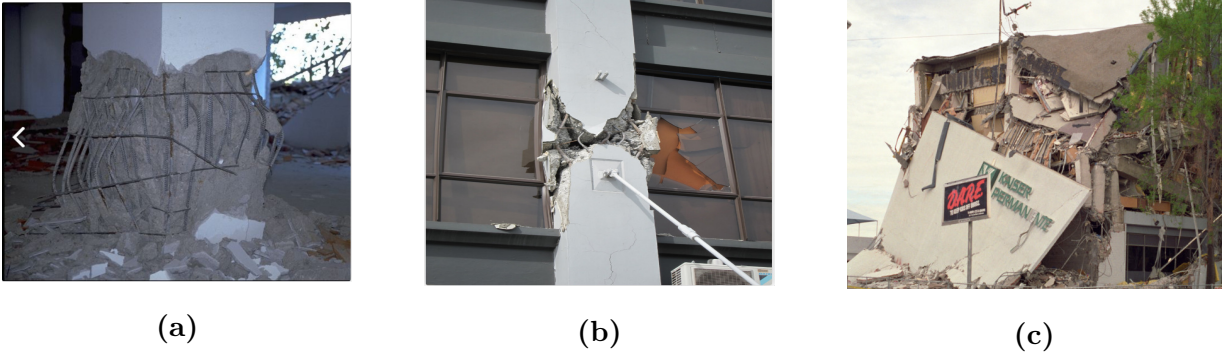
Failure of NDRCB including (a) axial failure at lap splice, (b) shear failure in a column, and (c) sideway collapse.
